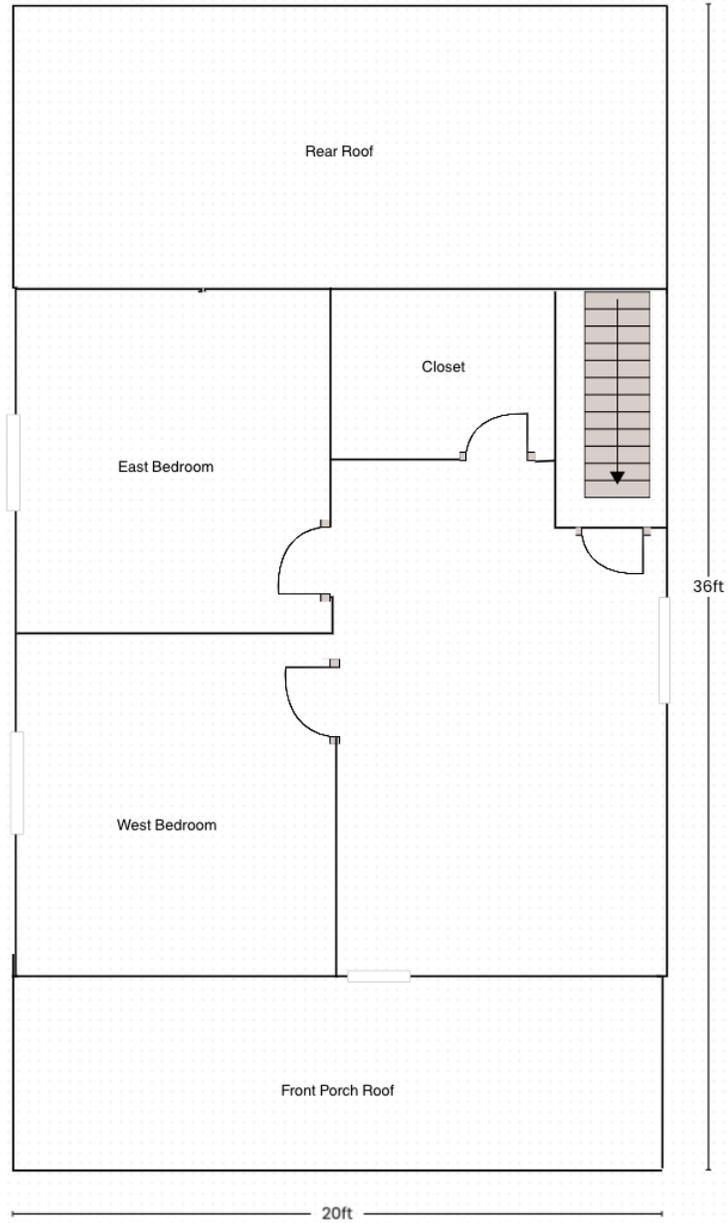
Two-Story Farmhouse Floor Plan, Second Floor (Schiffman).
